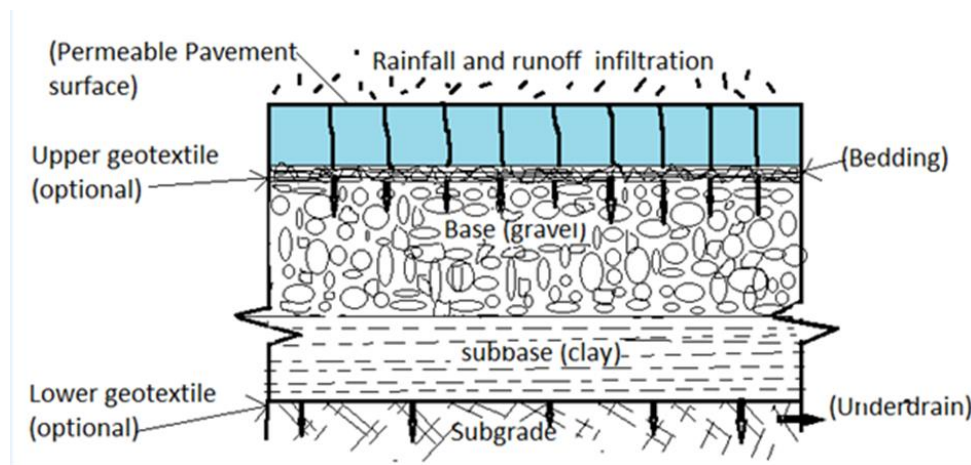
12 Typical cross section of pervious concrete for pavement.
